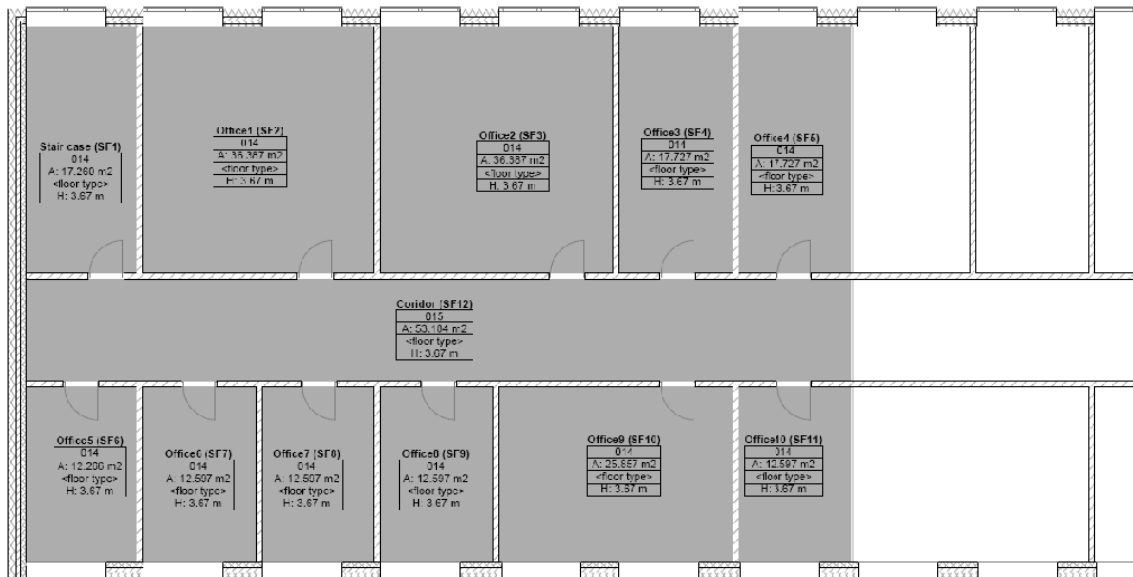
Floor plan from the BIM-model (Level 2.2), (not in scale)
